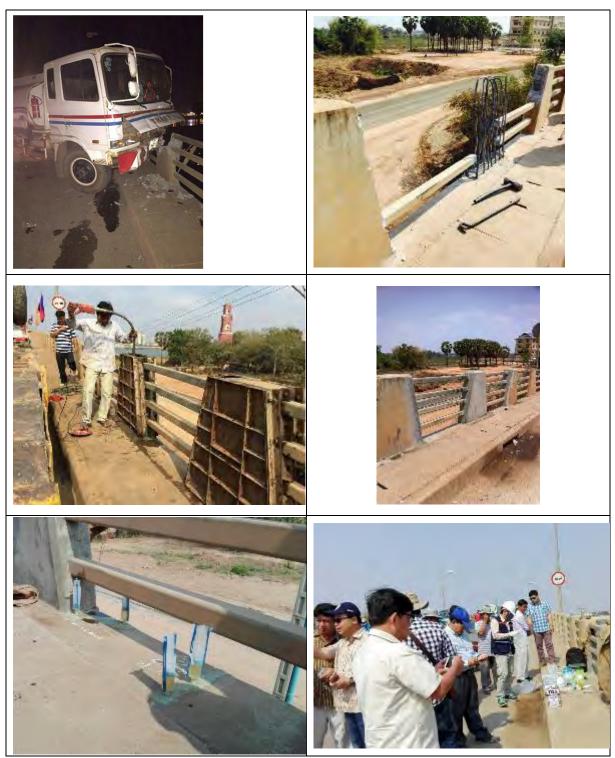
Repair of the Damage at Kizuna Bridge and Demonstration of Crack Sealing Method
